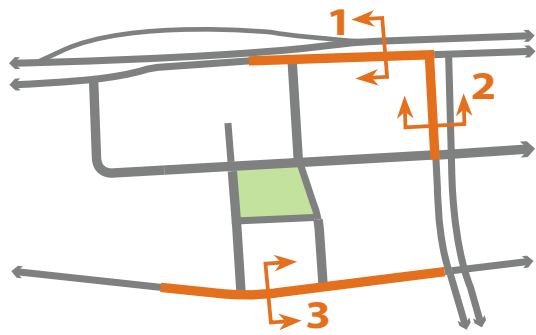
C - PROPOSED STREET SECTIONS - EXTERIOR
